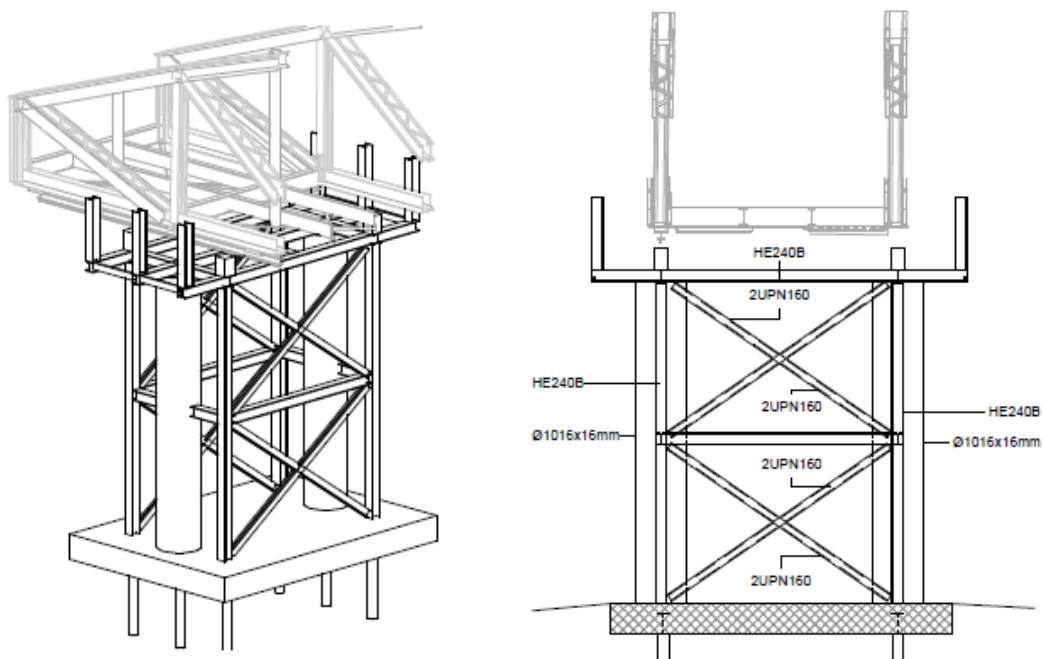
construction details of the provisional system consisting of the riverbed trestles
